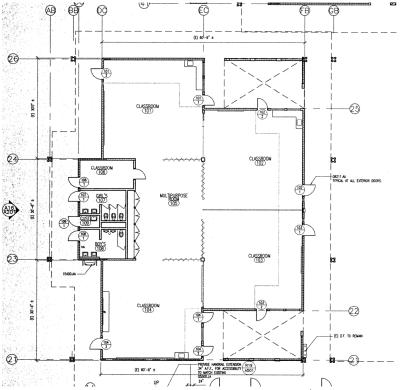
BUILDING 3: 1998 Modernization 1st Floor Plan
